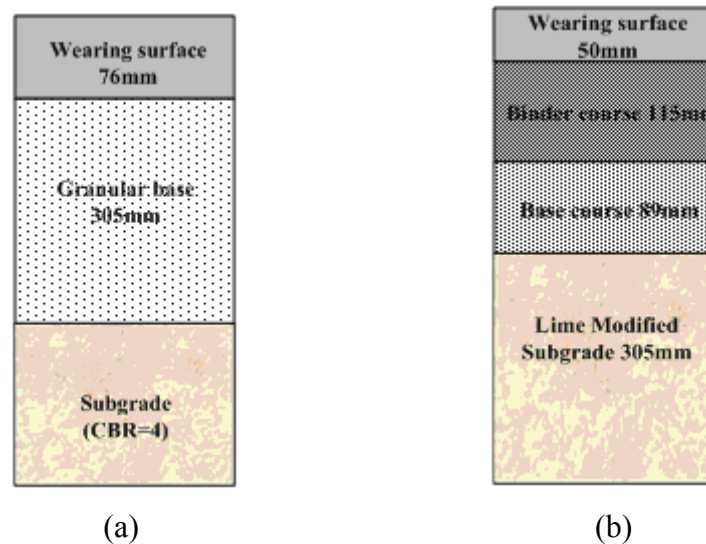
Cross sections of (a) thin asphalt pavement and (b) thick asphalt pavement
